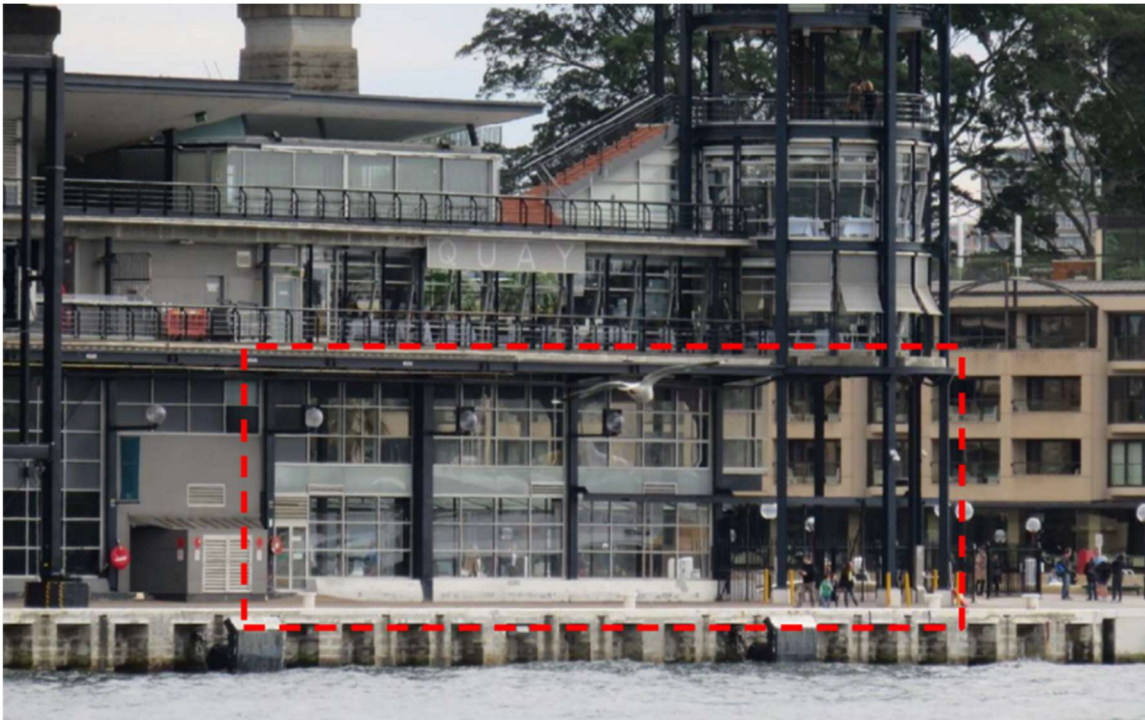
View west towards Tenancy 5 of the OPT building (Source: GML Heritage)
